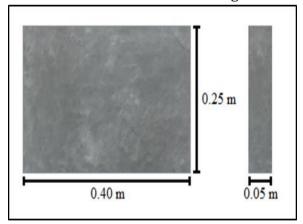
Illustration of scaled concrete retaining wall (front and side view)
